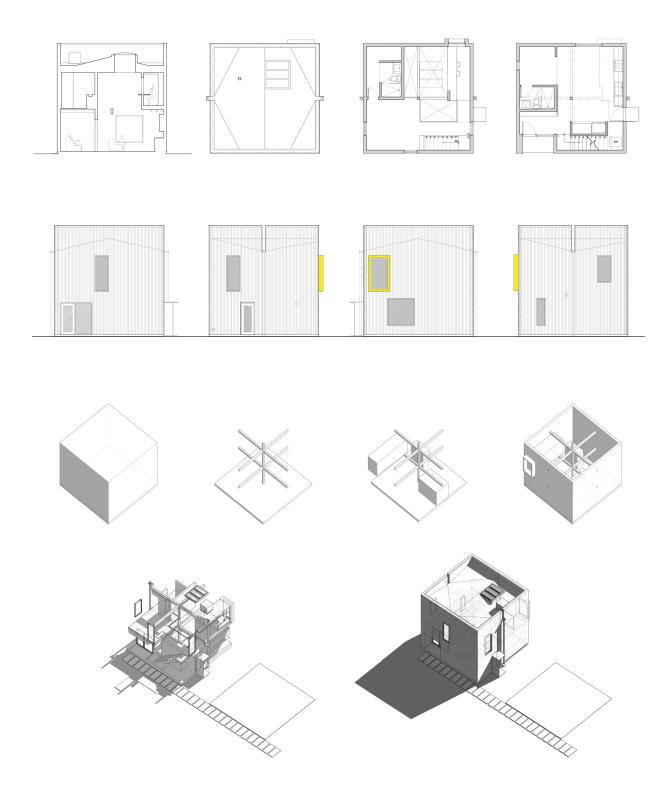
Plans, section, elevations and diagrams. Drawings by author.
